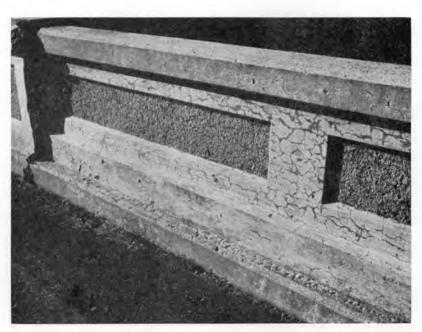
Deterioration of a bridge structure. Note the pattern cracking a sure sign of deterioration. (22613)
